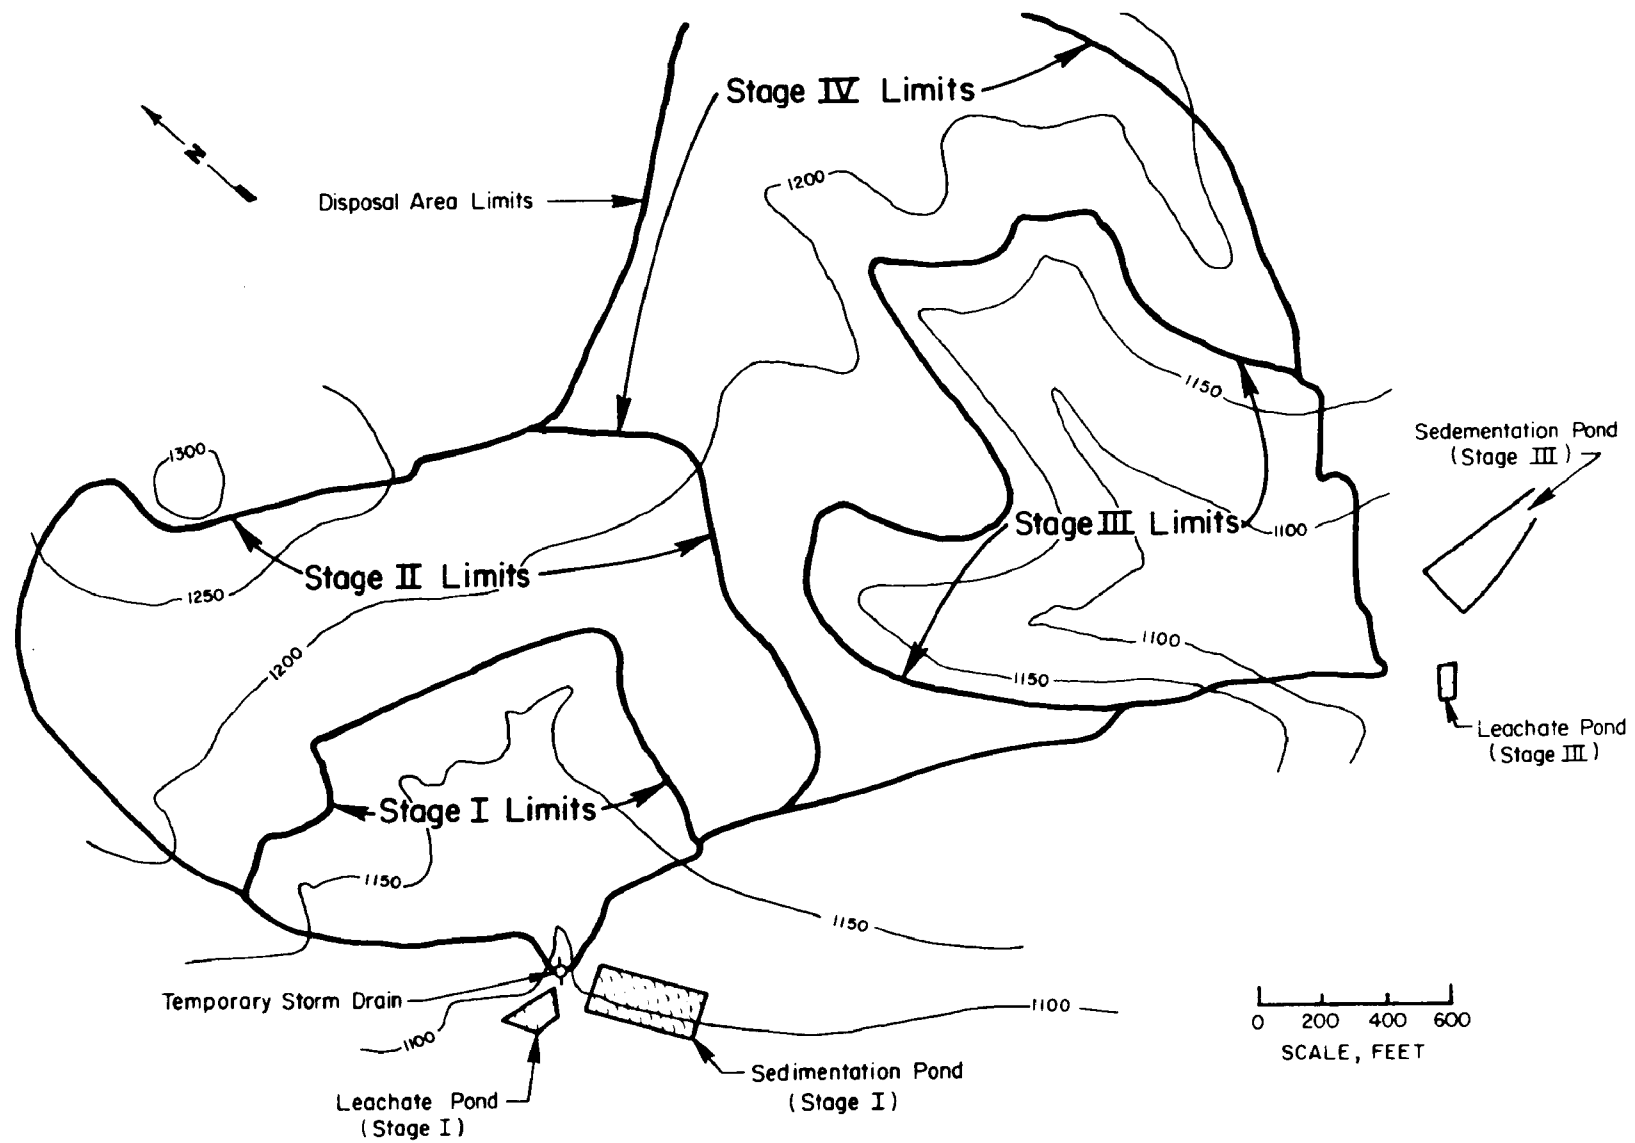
DISPOSAL STAGES AND POND LOCATIONS
